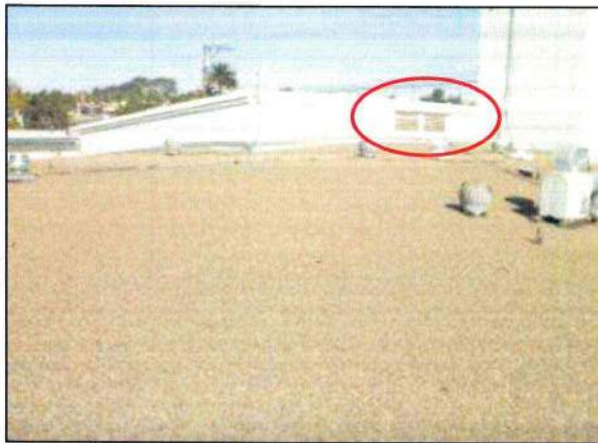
Fire Station #1 Wood louvers present at the roof are deteriorating and need to be repainted.
